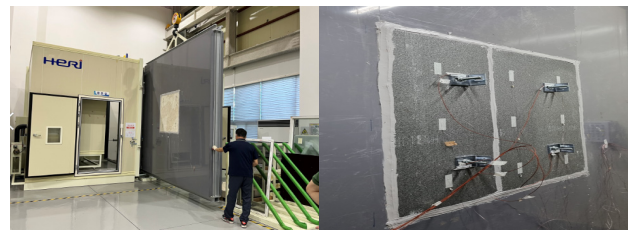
Schematic diagram of an insulated wall specimen installed with anchors
